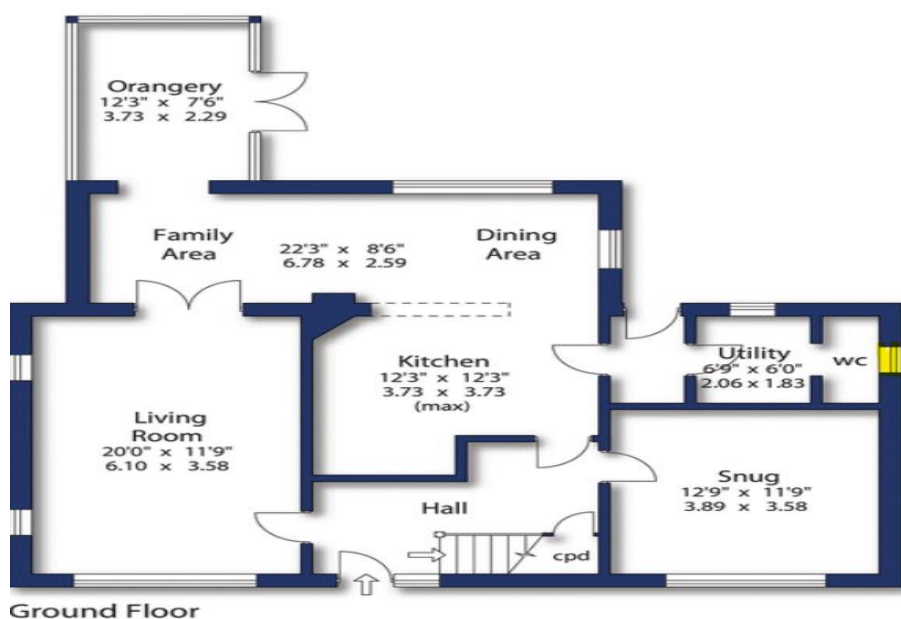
Image of ground floor plan of property 12 St Michaels with room window reference to above in yellow
